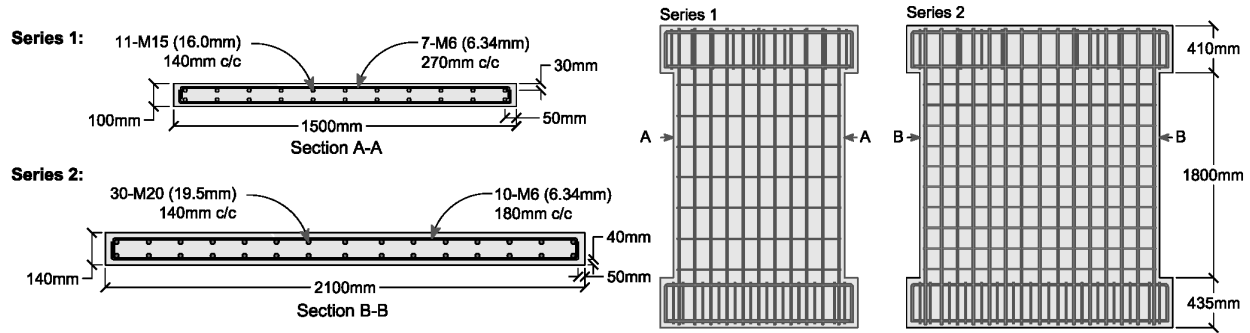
Typical steel reinforcement detail for W1 and W2 wall specimens.
